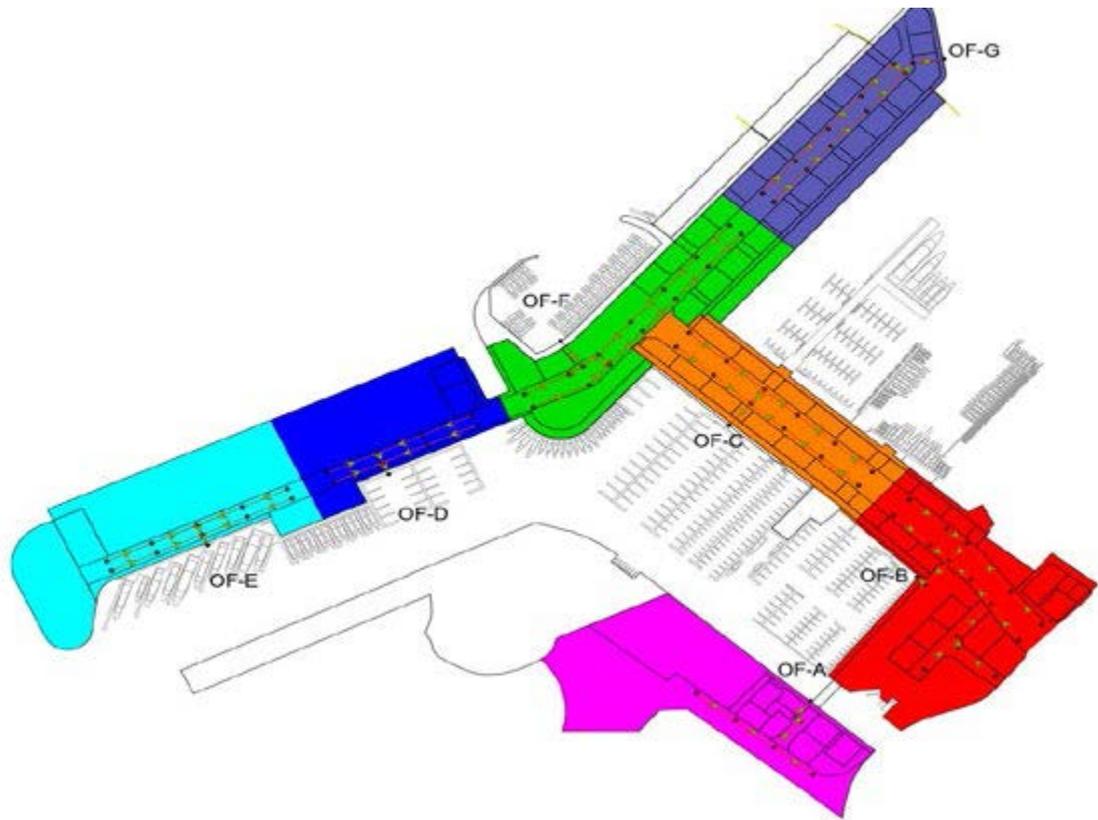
Proposed Drainage Network with Seven Outfalls
